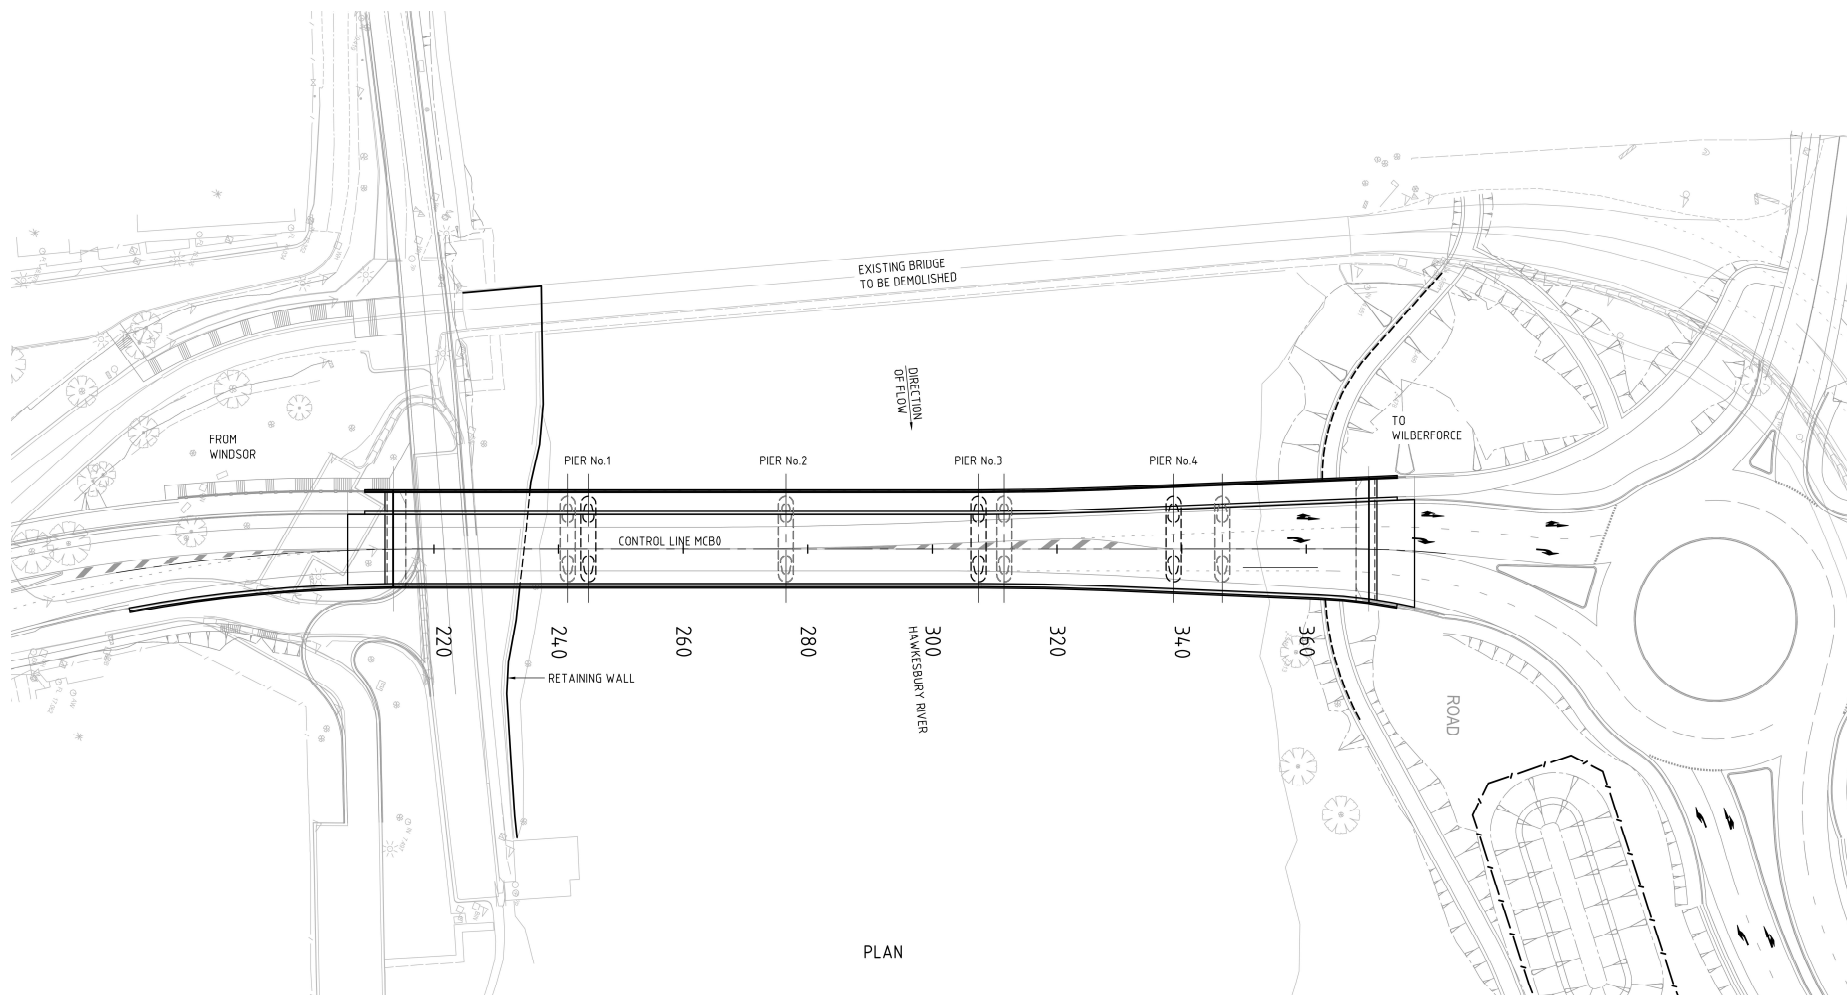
Changed pier locations – Note grey indicates original pier location and black indicates new pier location
